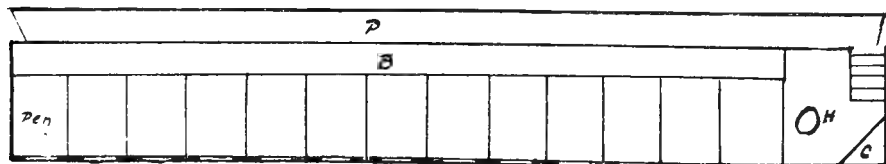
Ground Plan of a Long Brooder House—Pipe System—single row of pens.
